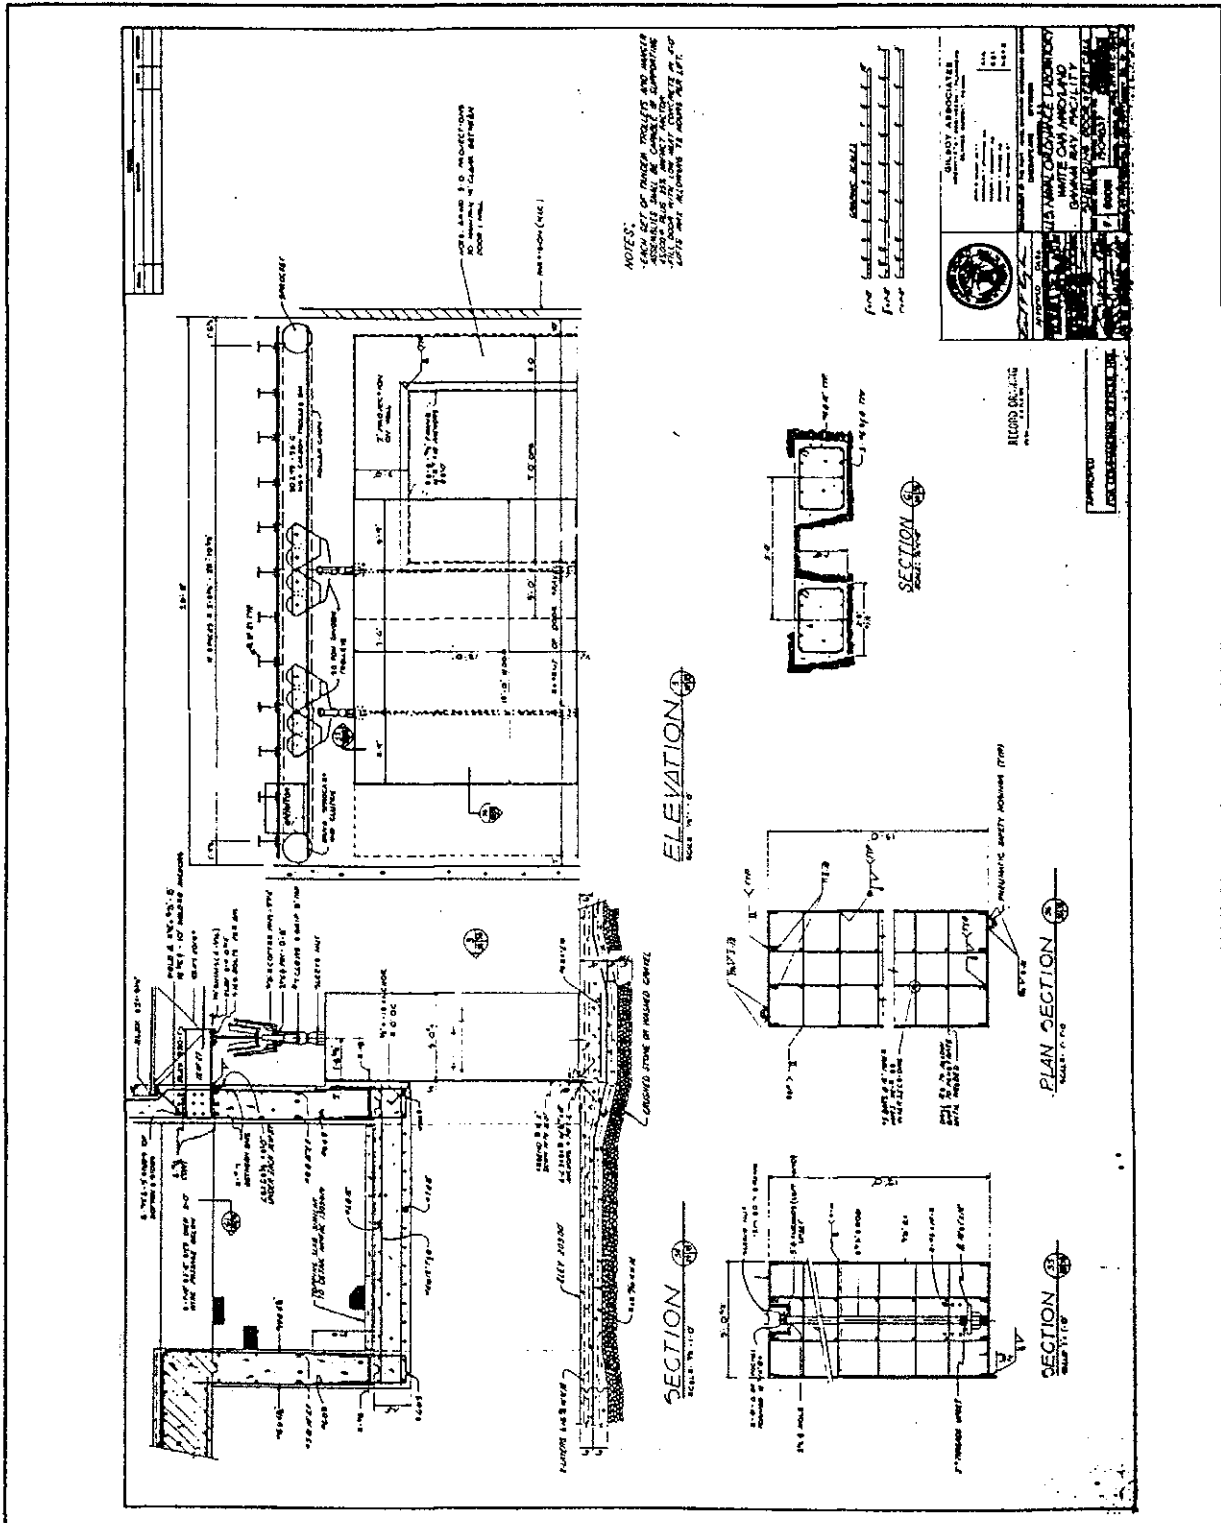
, U.S. Naval Ordnance Laboratory, White Oak, Maryland, Gamma Ray Facility, general building sections, 1969.
